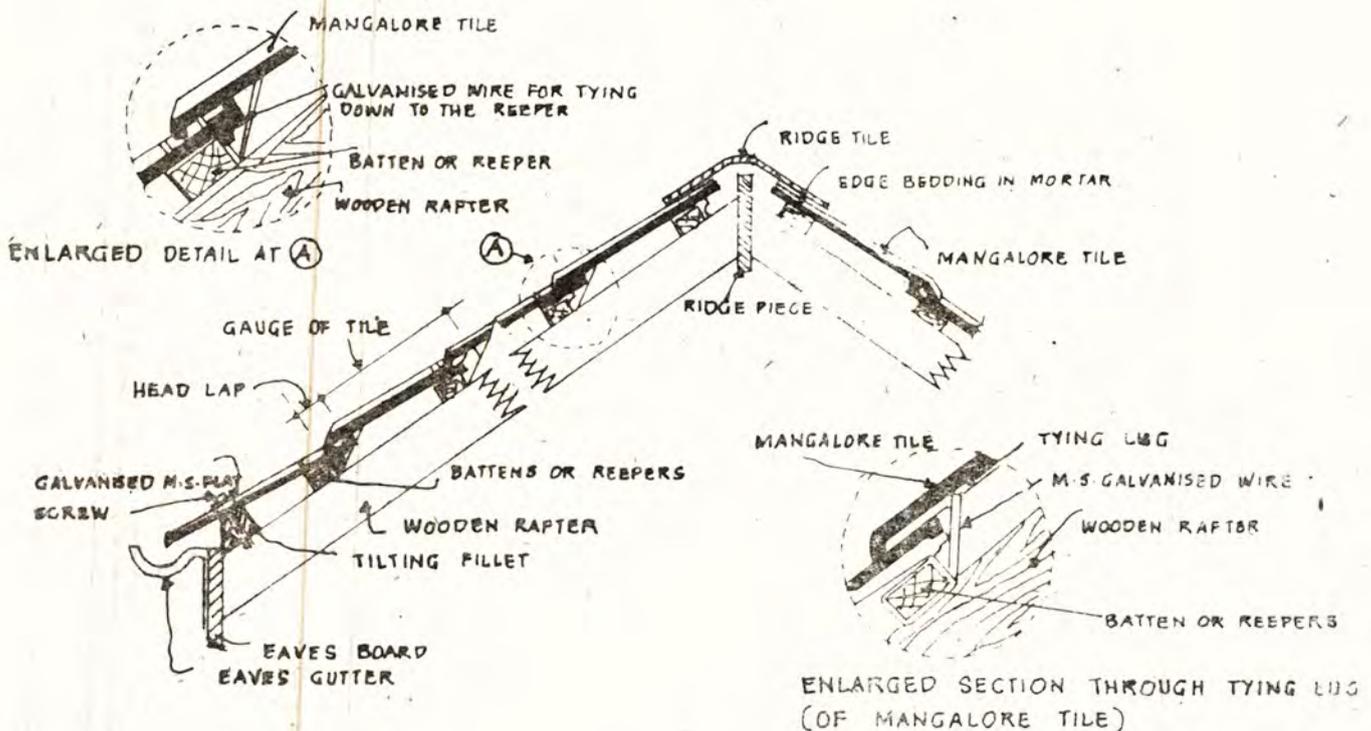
DETAIL OF MANGALORE TILES LAID ON REEPERS
